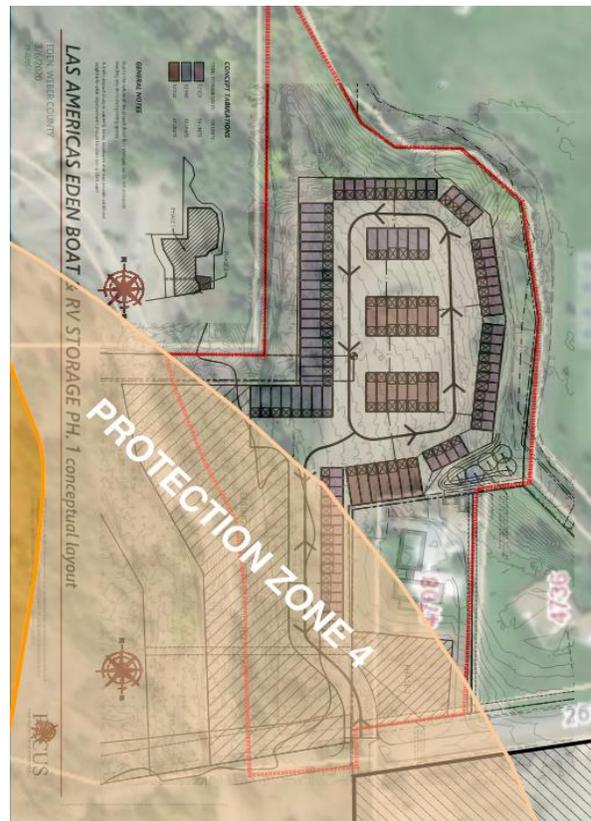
Drinking Water Source Protection Zone 4, superimposed on concept plan.
